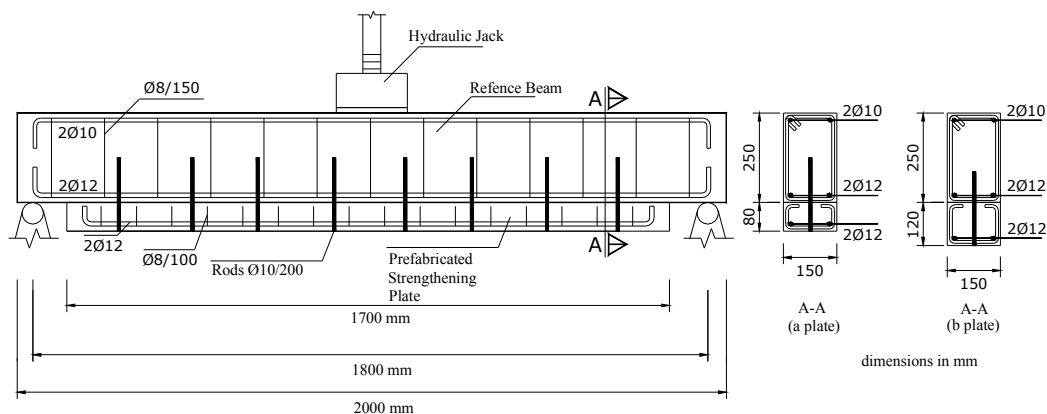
RC beams strengthened with prefabricated RC rectangular cross-sectioned plates
